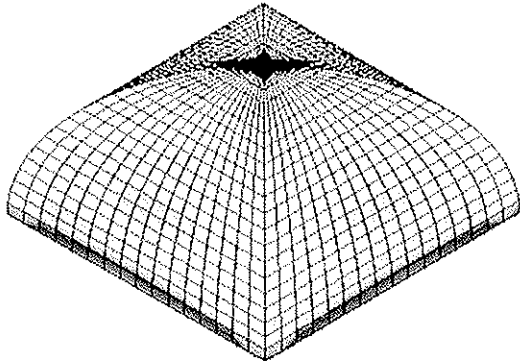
Axonometric showing the Finite Elements model of the pavilion vault.
